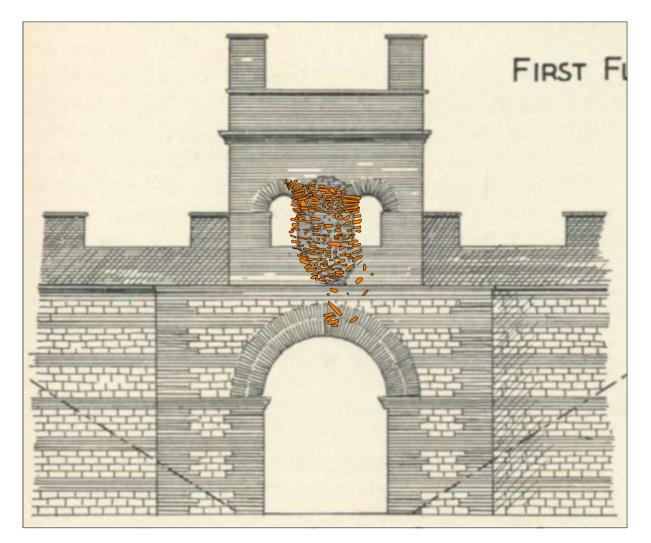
Second reconstruction of south elevation of Duncan's Gate showing the gate tower with two windows, with plan of collapsed masonry overlaid. Reproduced from Hull 1958, 41.
